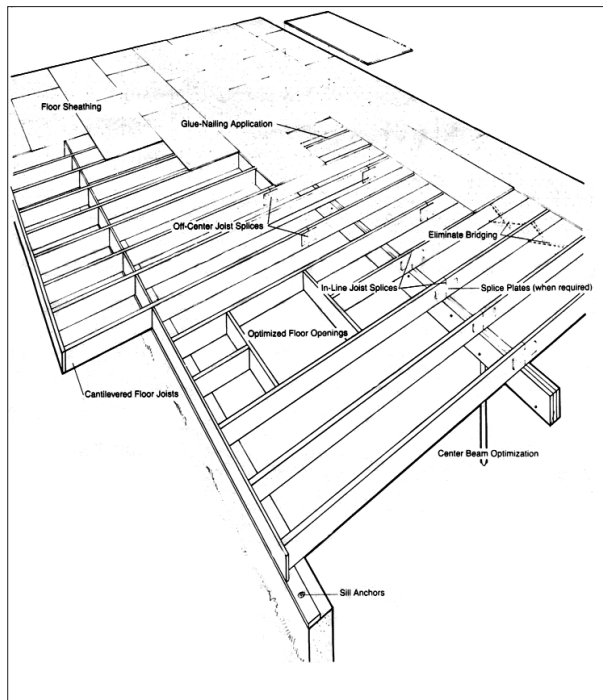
Cost-cutting techniques for floor systems recommended by HUD include glued subfloors, cantilevered joists, 2x4 sills, and joist splices to minimize lumber waste.
